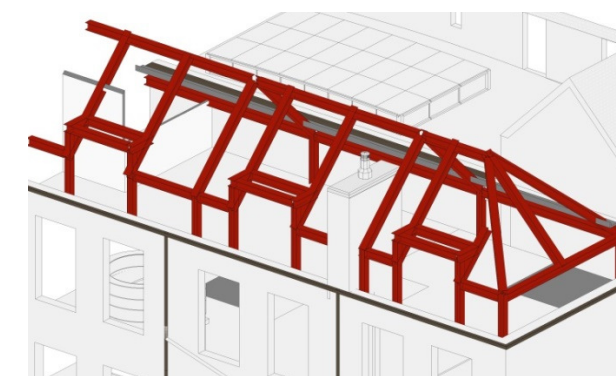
3D image of Refurbishment– from Revit Model
